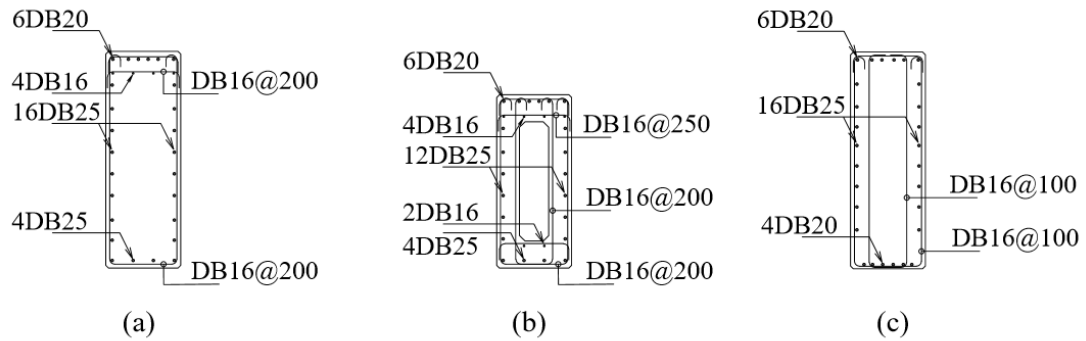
Reinforcement details (a) girder section at the end, (b) girder section at the middle, and (c) pier segment section.
